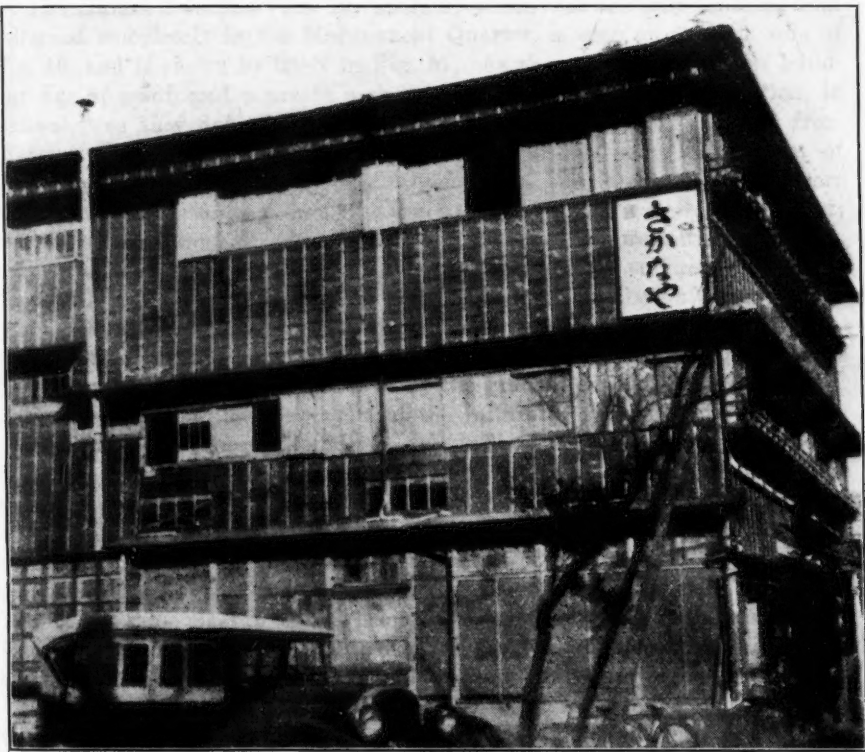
VIEW OF WOODEN THREE-STORY BUILDING OF JAPANESE ARCHITECTURE THAT WITHSTOOD THE IDU EARTHQUAKE.
